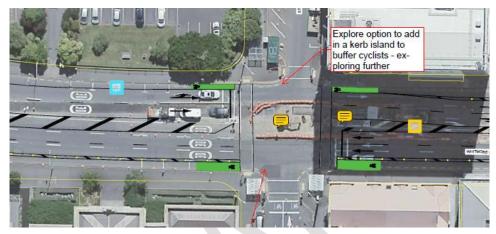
Excerpt from plan - Whitmore Street / Stout Street intersection (C18)
